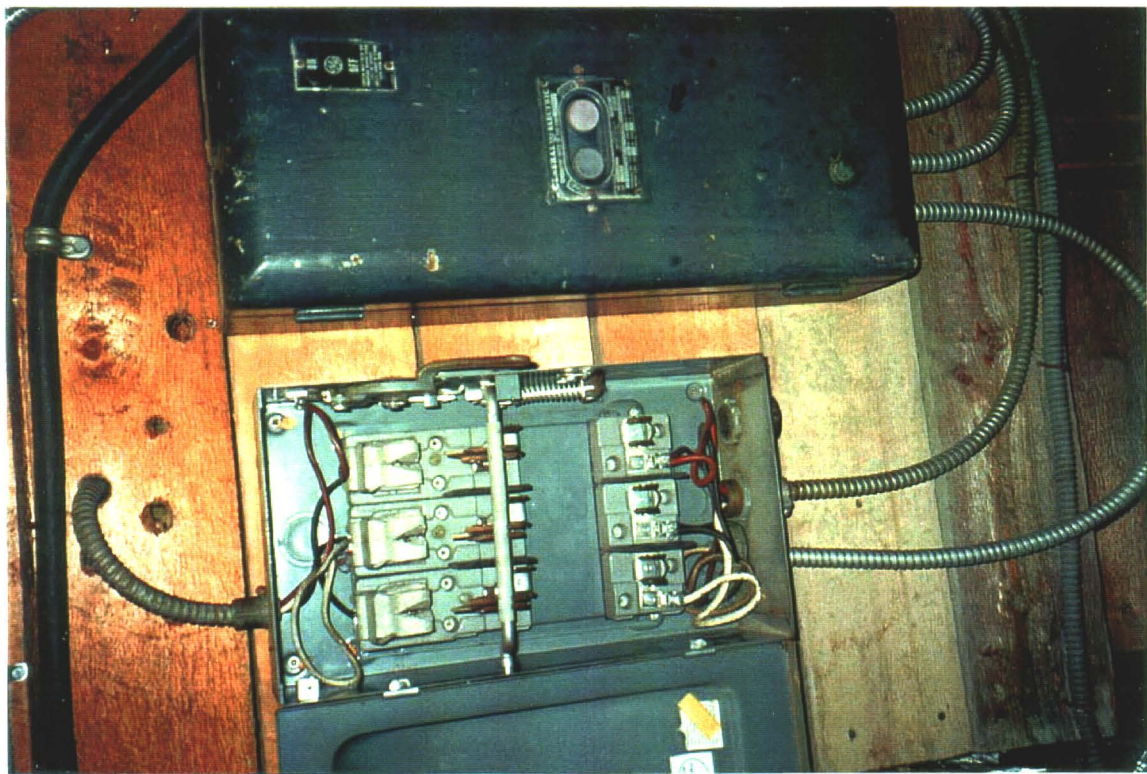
Electrical boxes in small shed near loading facility on Calumet 1-15 dump.
